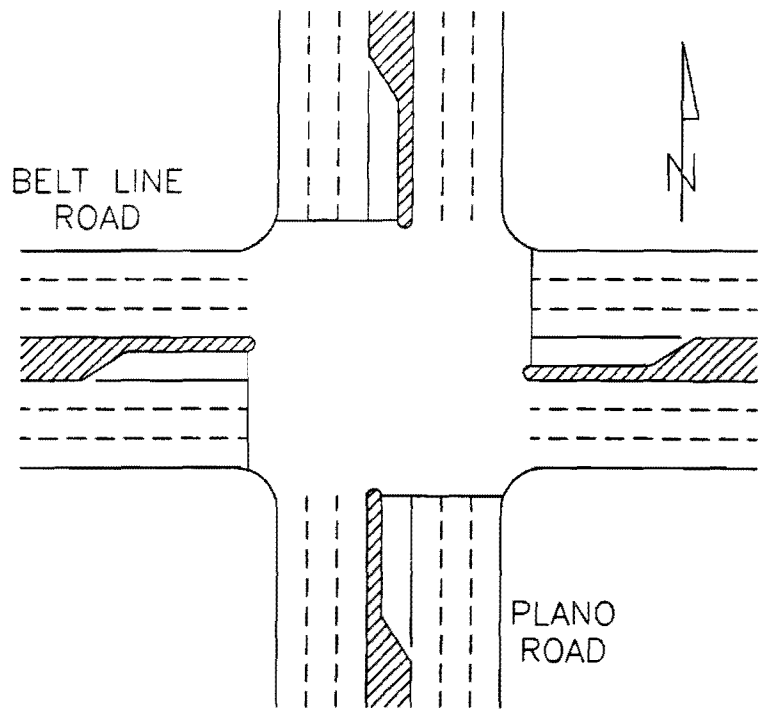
Plano Road and Belt Line Road, Richardson TX.
